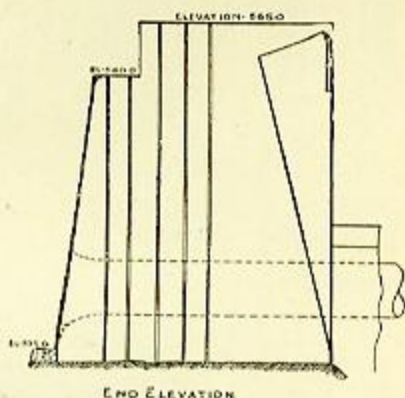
Section of Forebay Wall, The Niagara Falls Hydraulic Power & Mfg. Co.
